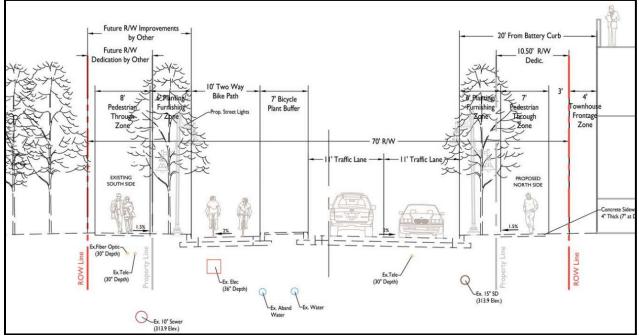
Staff Recommended Separated Bike Facility on south side of Battery Lane looking west
